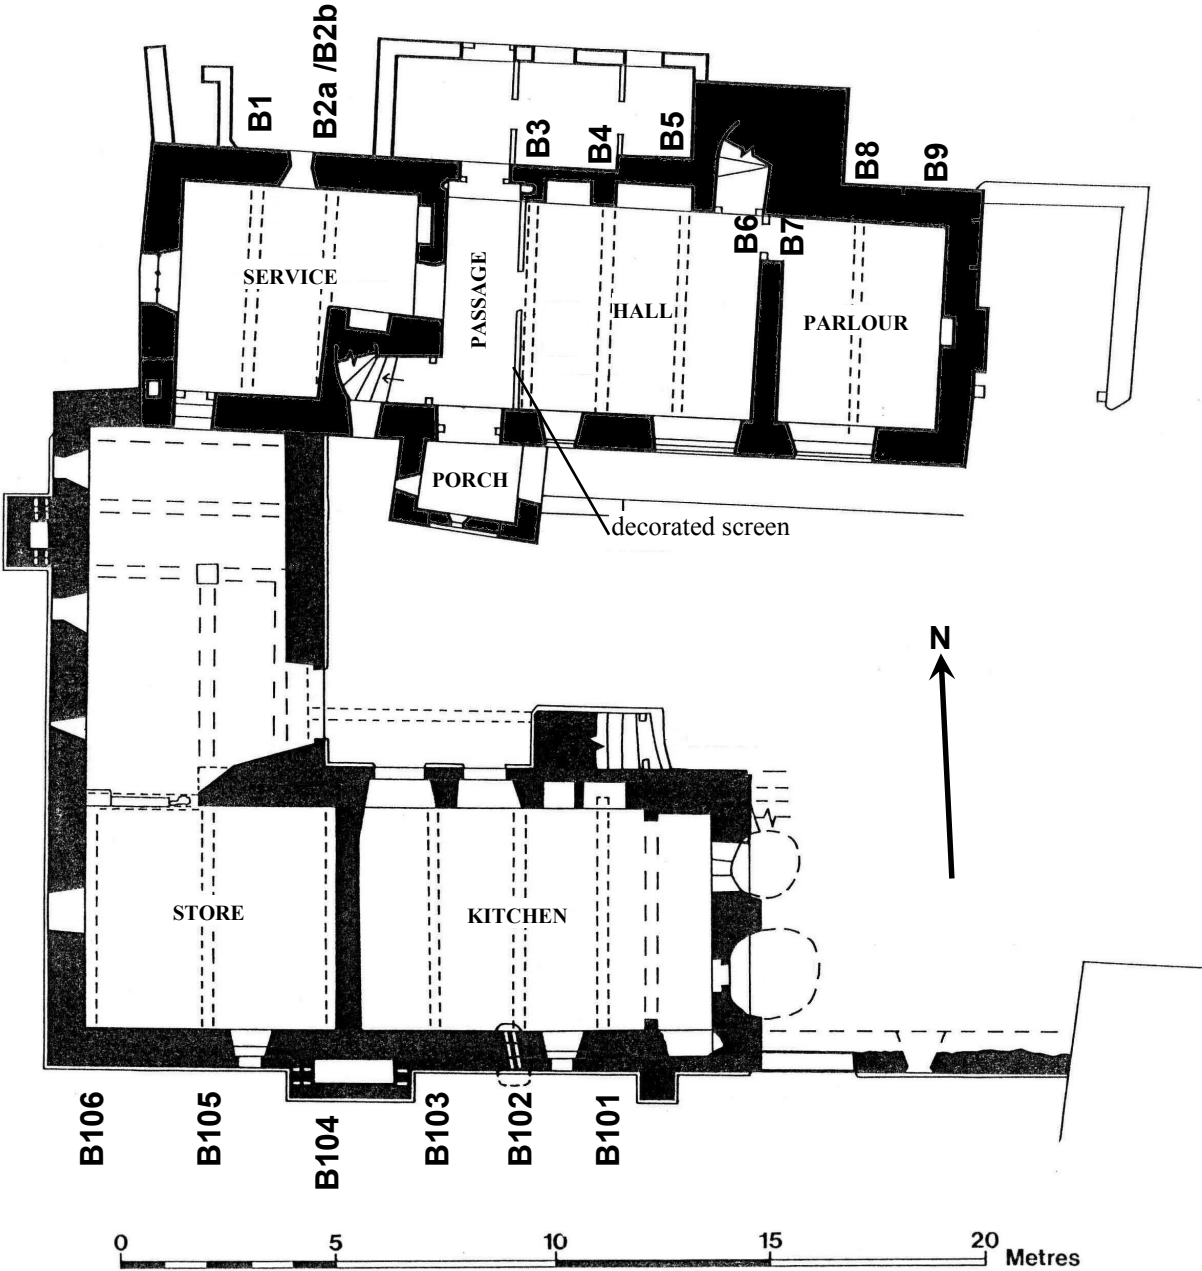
Plan of the first floor showing, where possible, the approximate location of the samples (after Morley 1983, Fig 4)
